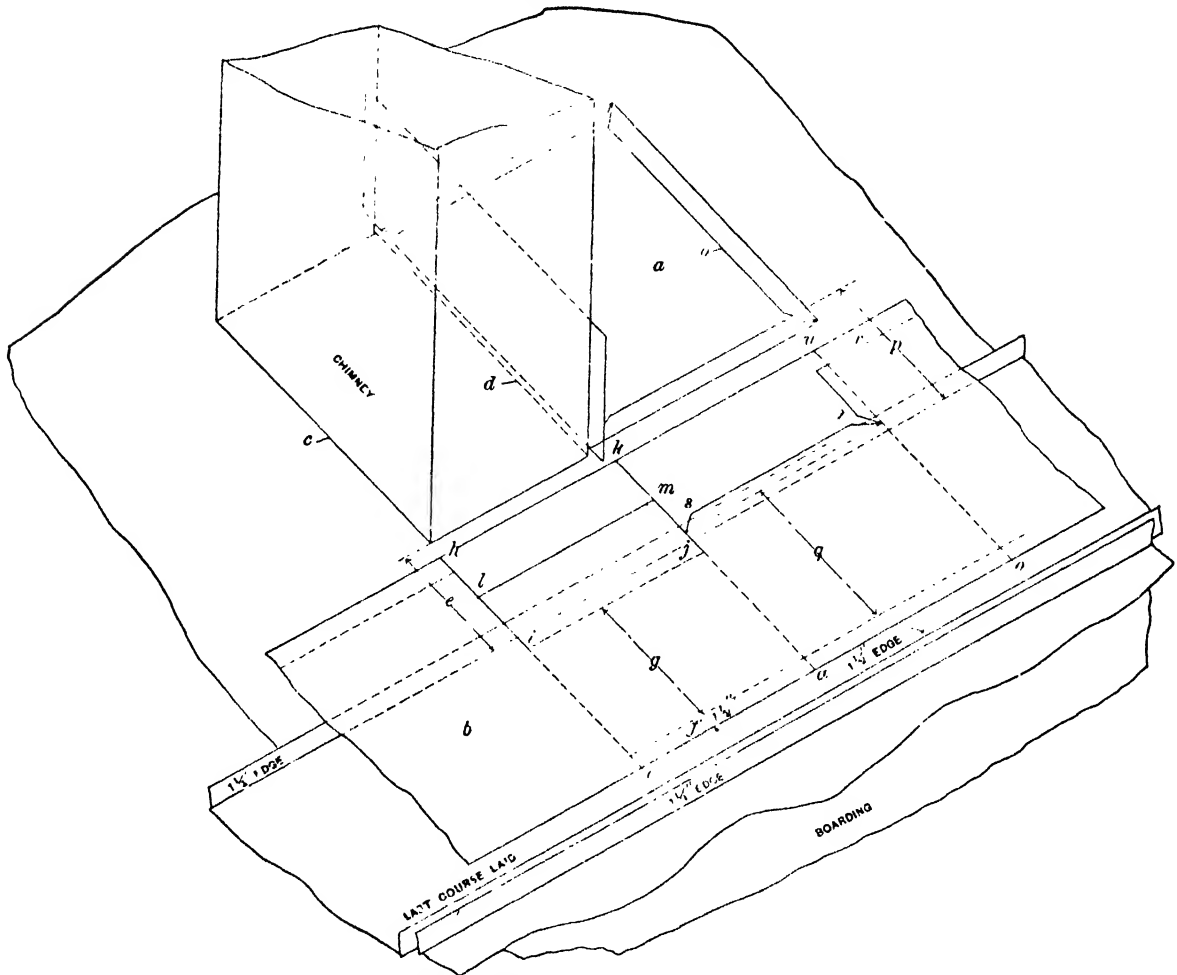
Laying a Standing Seam Roof Around a Chimney
